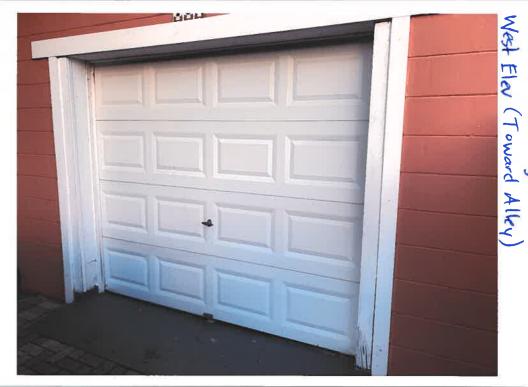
Garage Poor Enclosure * New Windows 1A + 1B West Elw.
